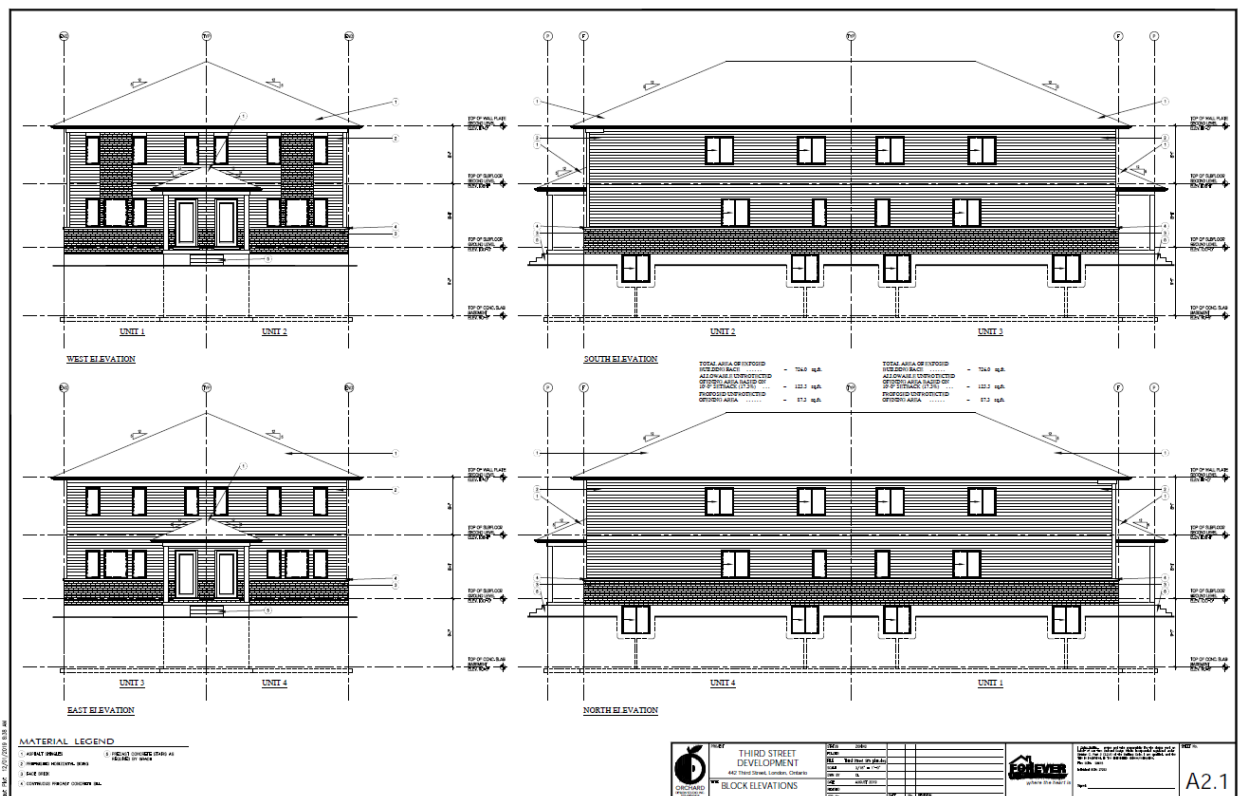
Proposed 14 unit building Elevation – submitted by applicant
